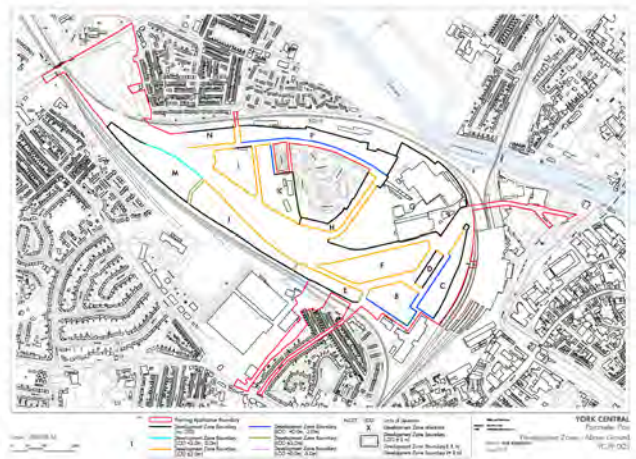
Parameter Plan 005 Development Zones - Above Ground
